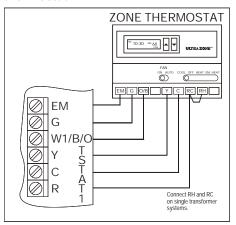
Wiring for heat pump thermostat with a single O/B terminal in Zone1.
